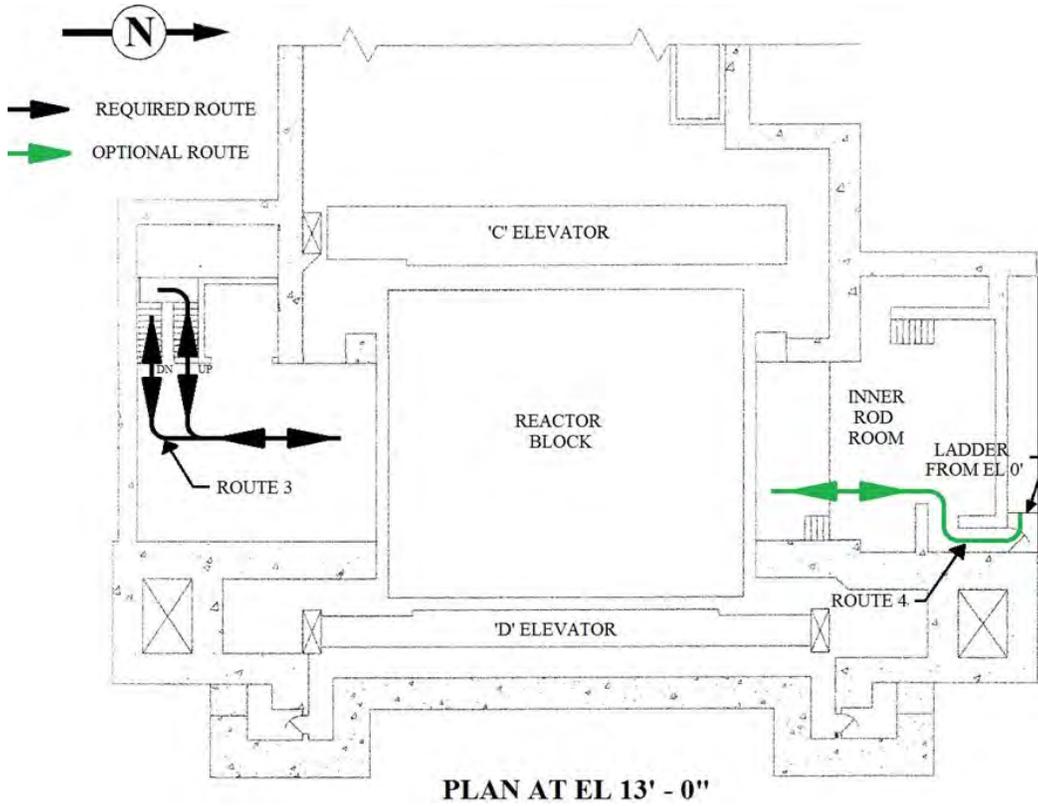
105-DR Safe Storage Enclosure Floor Plan Elevation 13 ft - 0 in.
